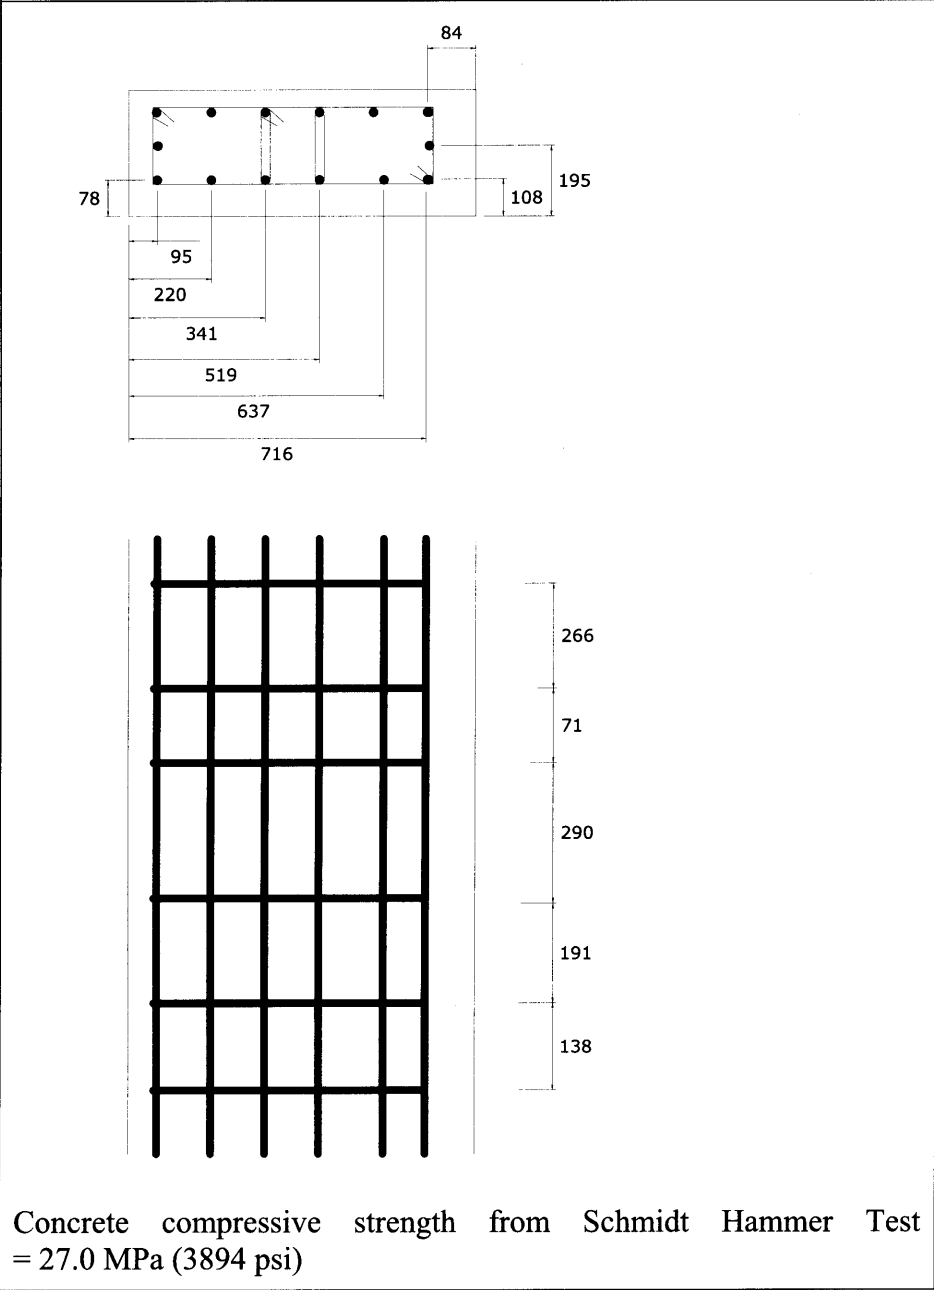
(b) Detection of column reinforcement at the 6th floor of EME building.
